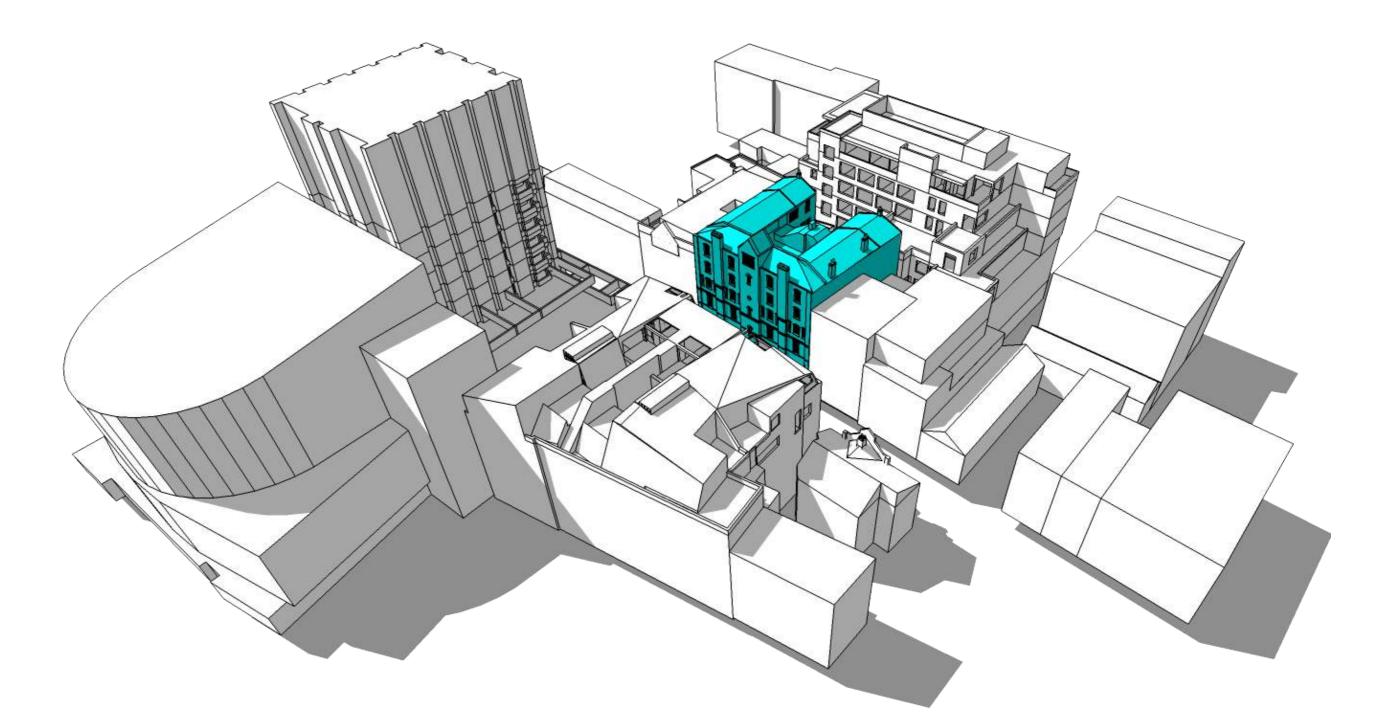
LUPUS HOUSE BUILDING CONTEXT
